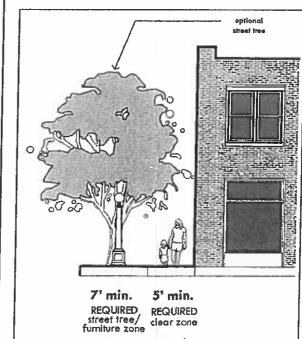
Urban Roadway Sidewalk Width Requirements from City of Austin Site Development Standards, Subchapter E: Design Standards and Mixed Use,
